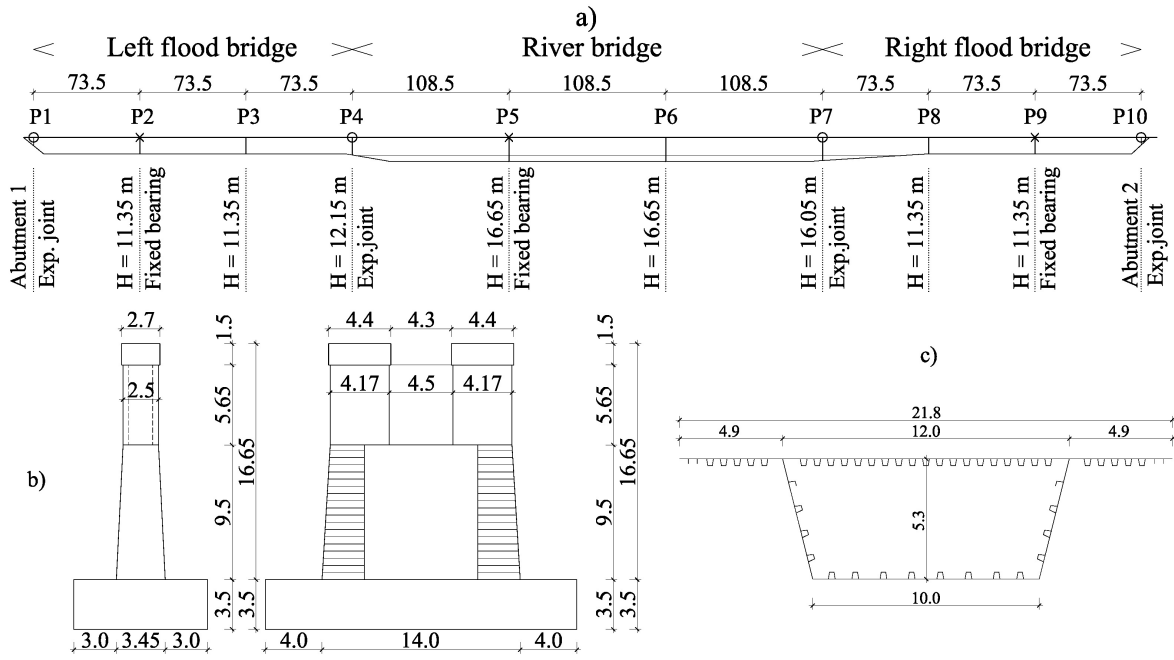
Configuration of the existing bridge. a) side-view of the bridge; b) side-views of pier P5; c) cross-section of the river bridge girder.
